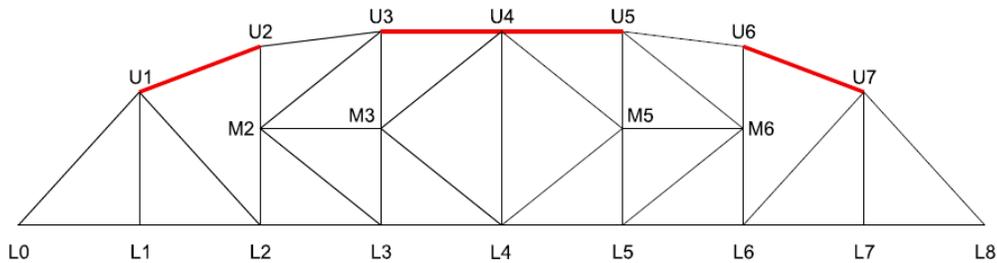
Overstressed Truss Members (Span 4) – Rehabilitation with Widening
